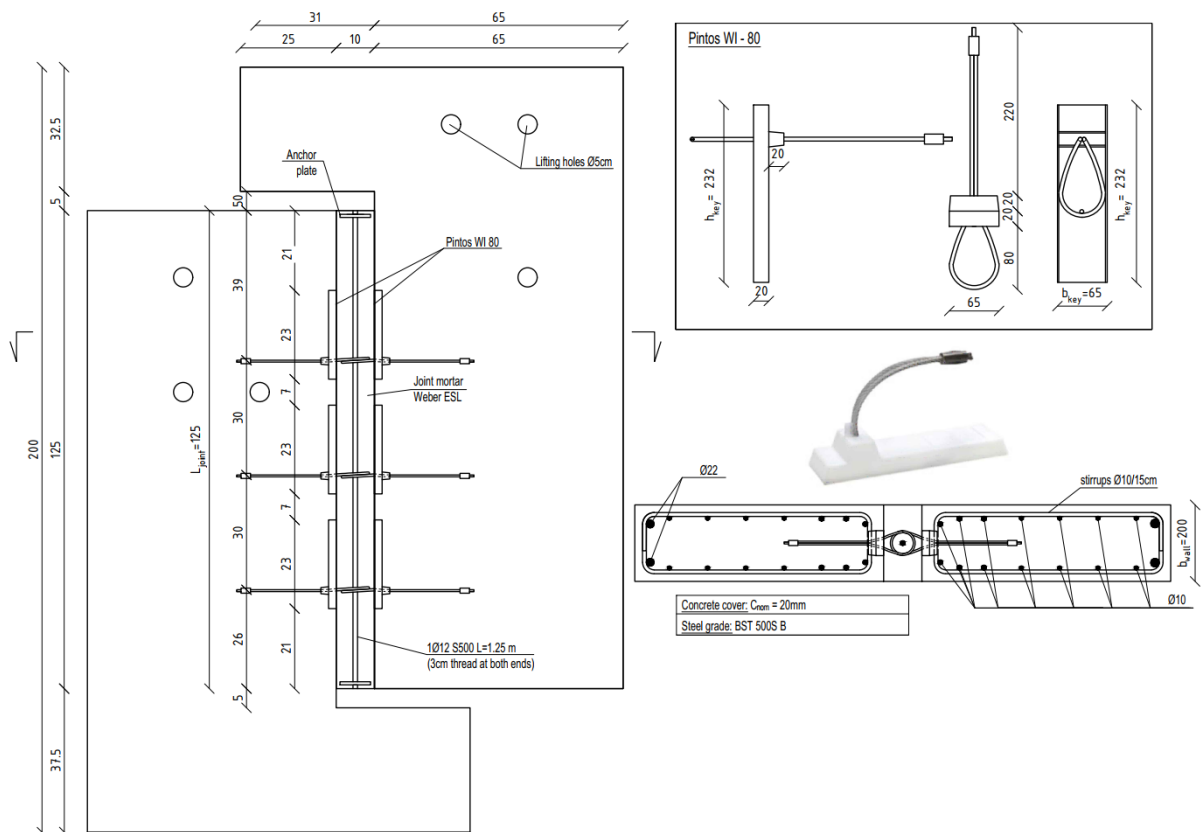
Configuration of WL2 specimens (dimensions in cm)
